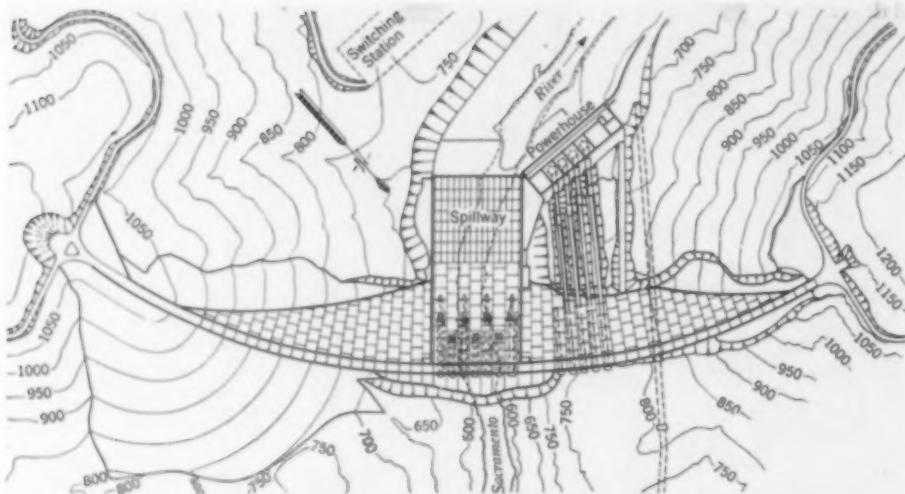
PLAN VIEW OF SHASTA DAM AND POWER PLANT
